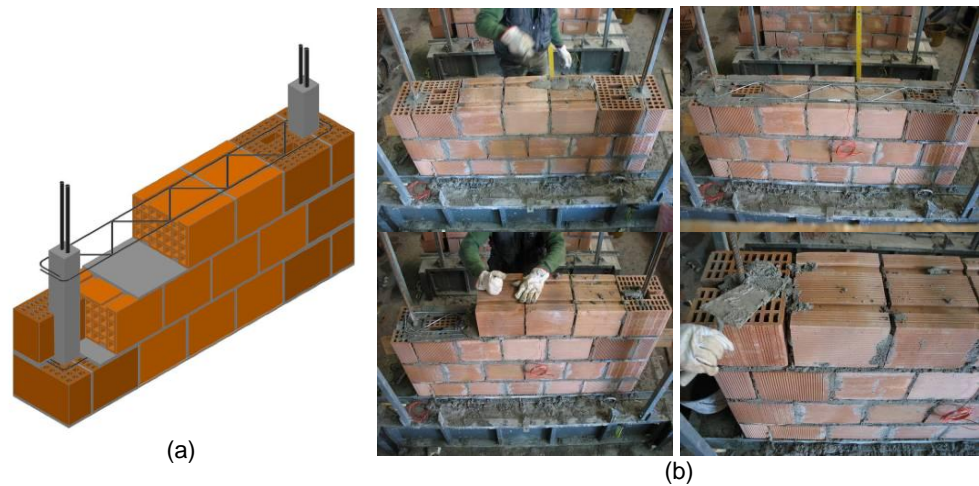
(a) Reinforced masonry system and (b) construction phases.
